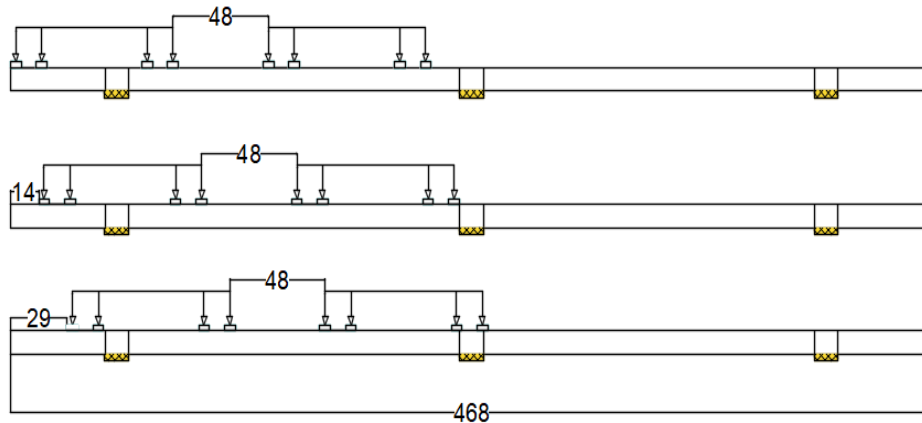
Location of P-15 truck for 15 ft girder spacing deck slab (2 cells, Case 3, unit: in)
